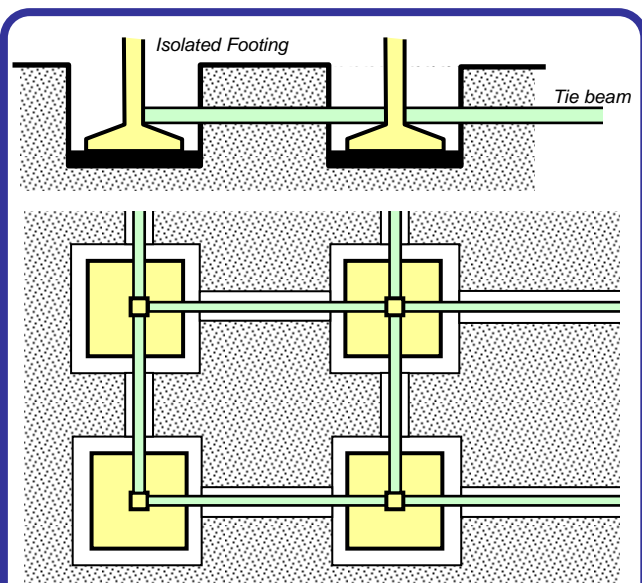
Good foundation design practice in non-liquefiable soil conditions – RC tie-beams between columns at the top of the isolated footings
